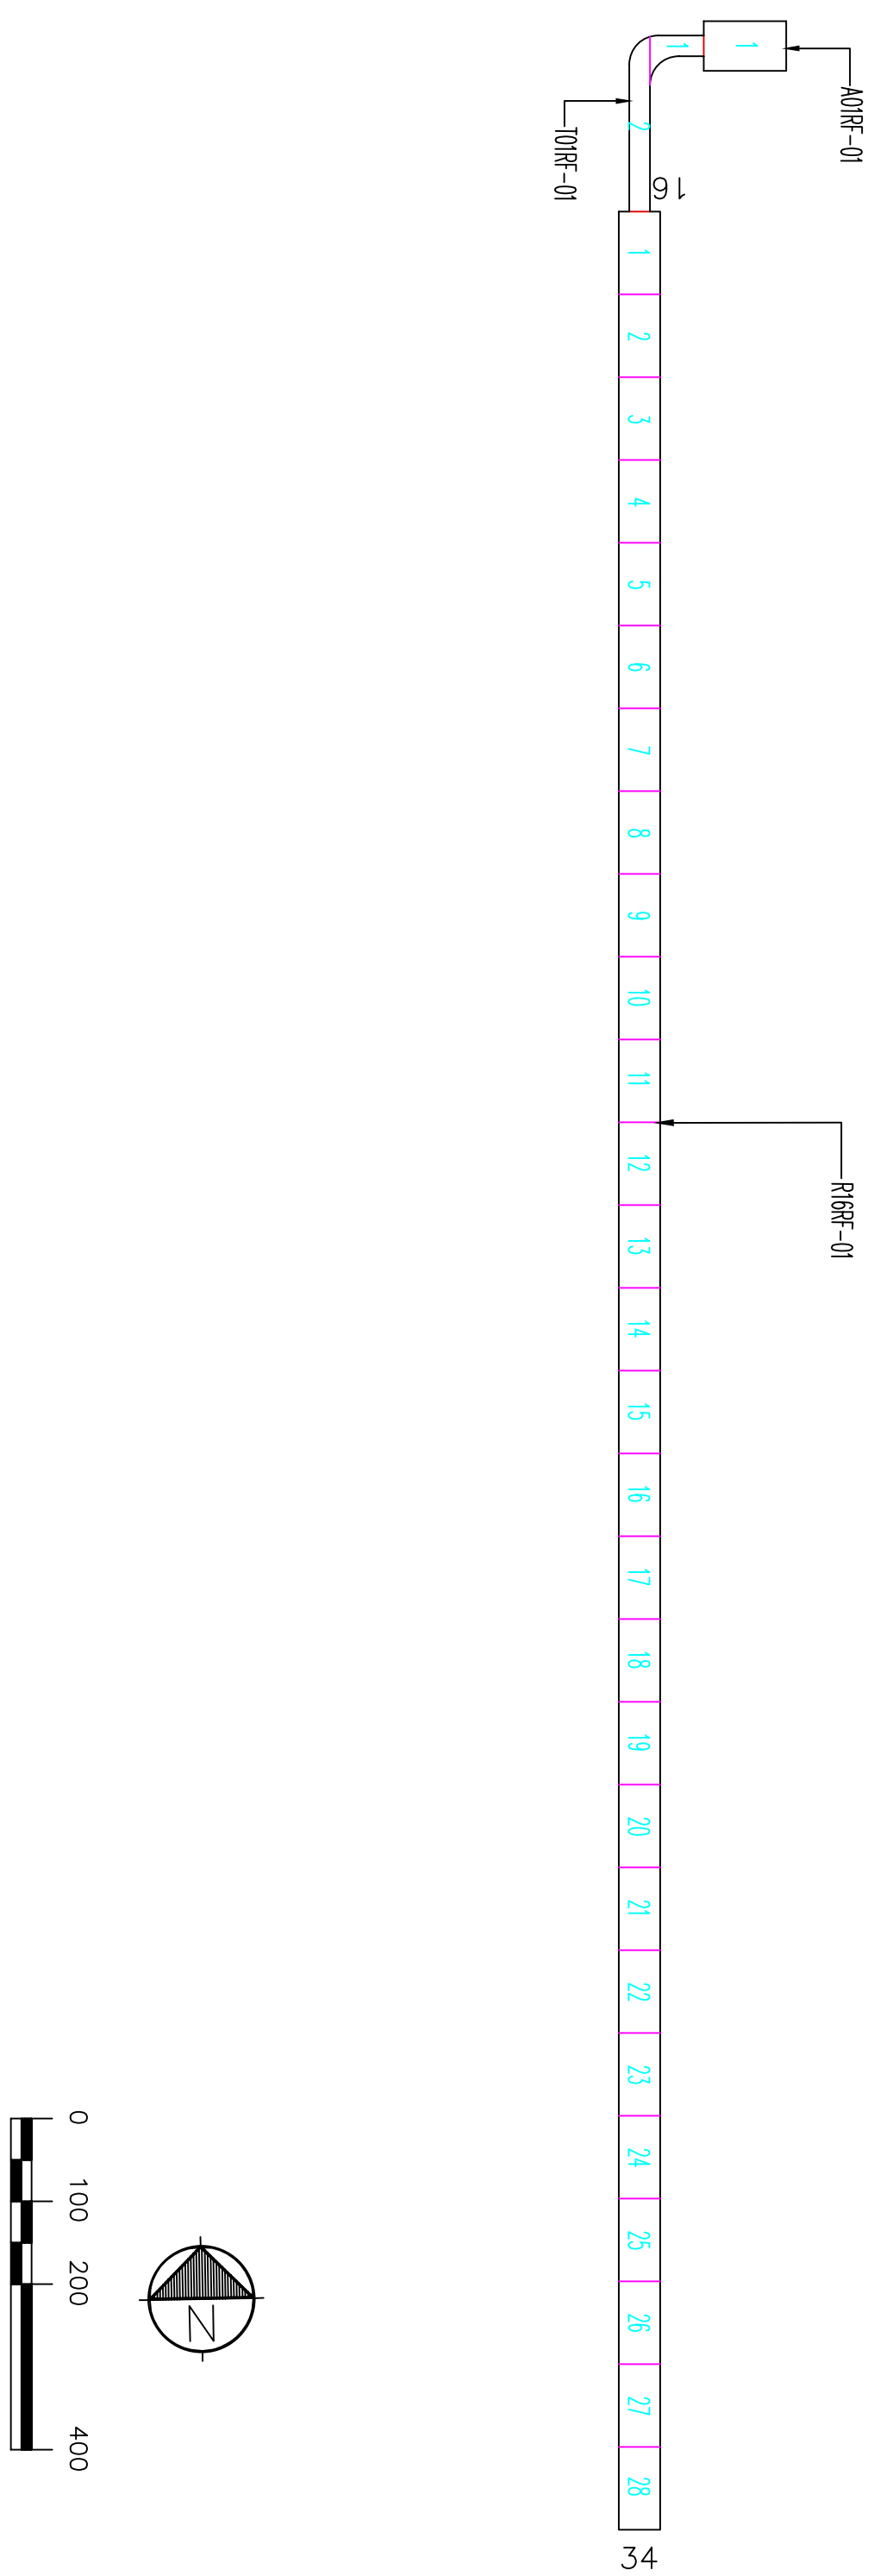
Pavement Branch, Section and Sample Unit Layout.
